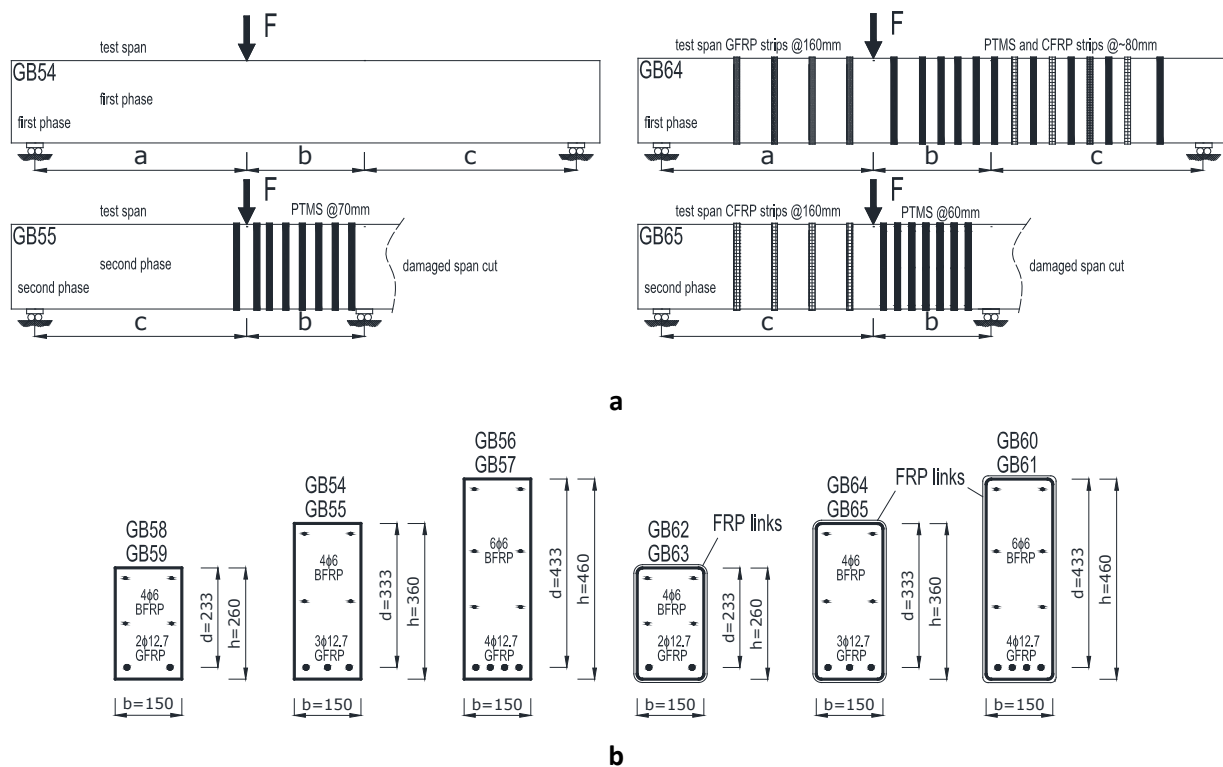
a – test phases of the beams GB54 and GB64 and their retests; b – cross sections of the beams
